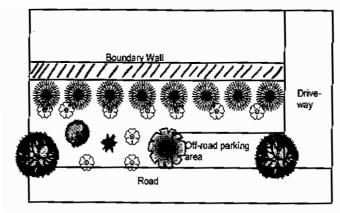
Schematic diagram of example off-road parking and verge landscaping
